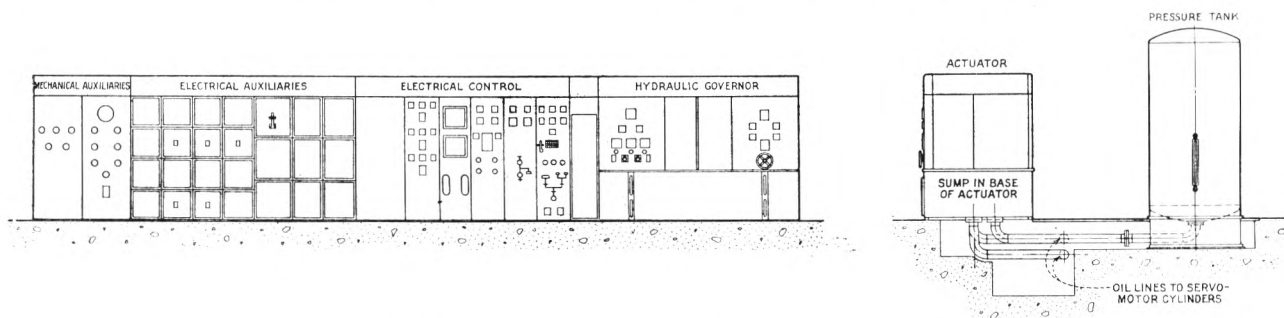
ARRANGEMENT OF CONTROL BOARDS AND GOVERNOR
